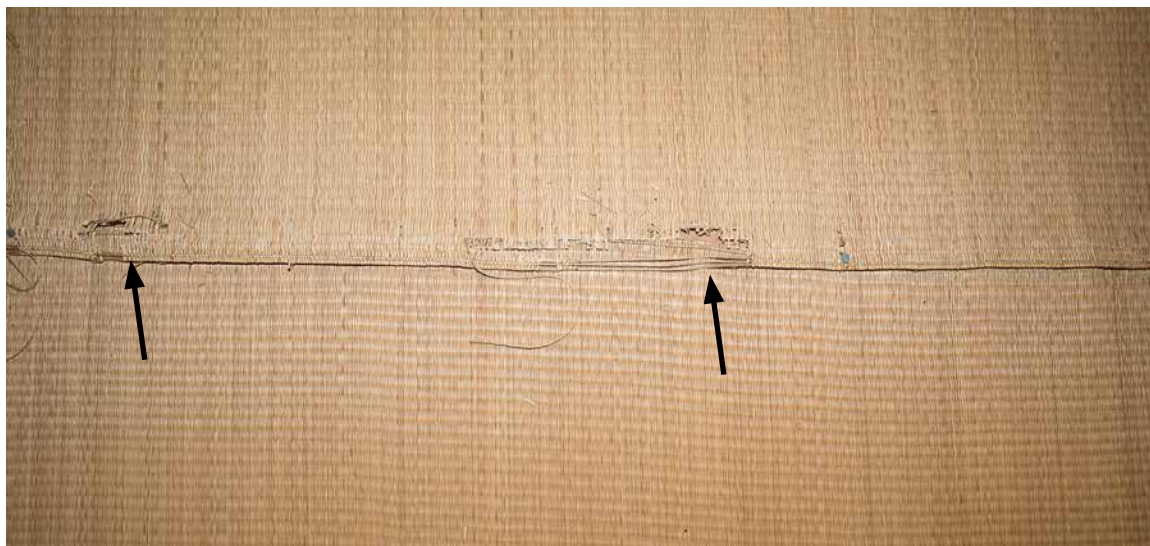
Wear on the edges of the straw matting (arrows) on the floor of the second floor kitchen chambers. This wear poses a tripping hazard for visitors. The matting should be redone with new matting similar to the existing. It was installed as a period appropriate floor treatment to cover the plywood sheets that were installed over the original floor boards to stiffen the floor and prevent loss of paint on the kitchen ceiling
